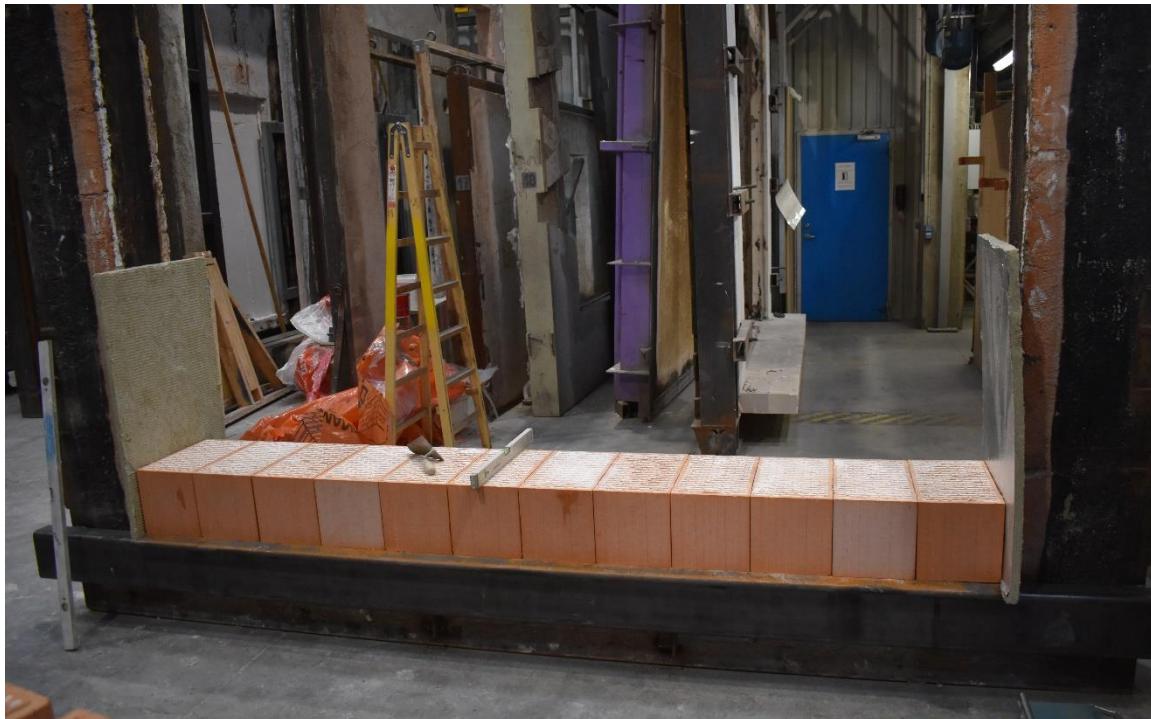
The first layer of the wall was built up with mortar before placing the blocks
